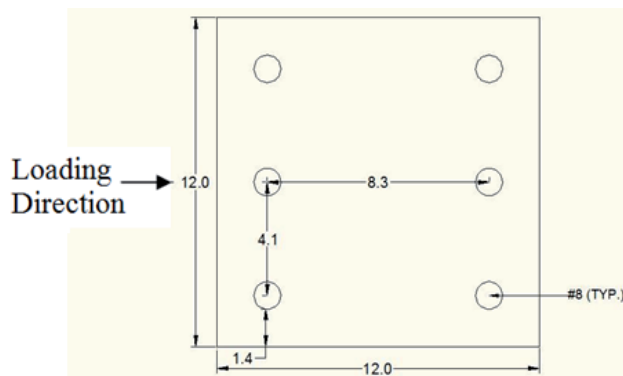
Cross-Section of SCSFC Column (dimensions in inches)
